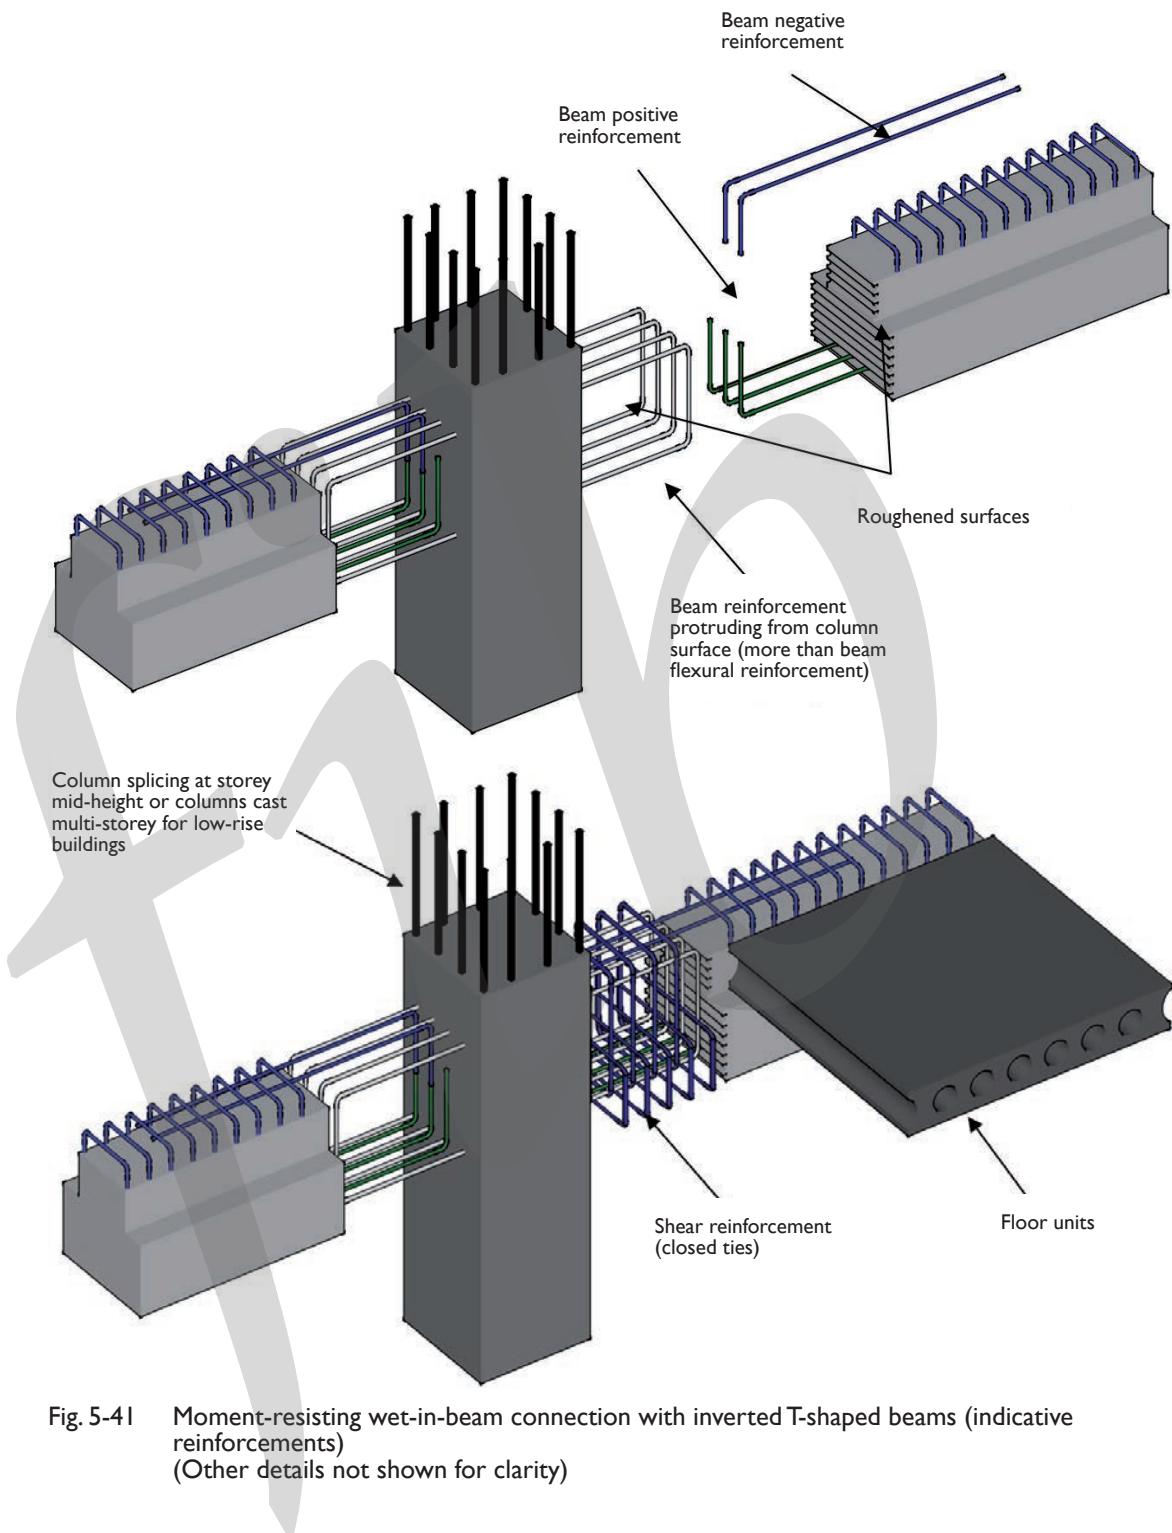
Moment-resisting wet-in-beam connection with inverted T-shaped beams (indicative reinforcements)
